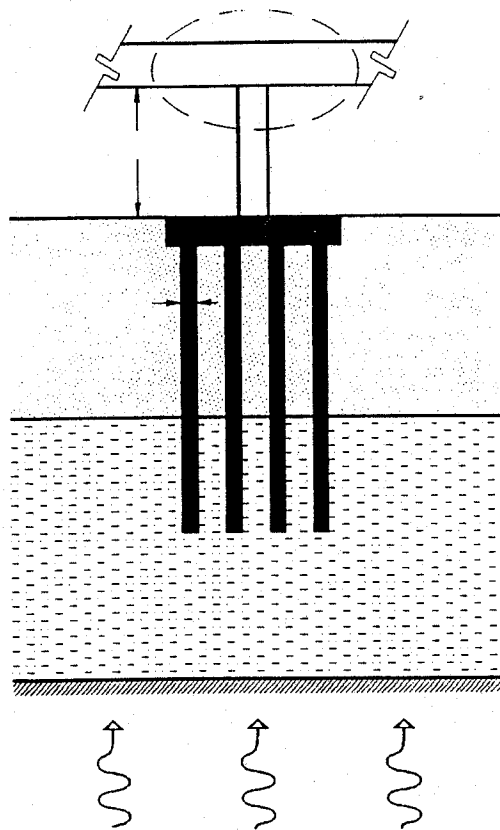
A bridge-pier supported on piles through a 2-layer soil
